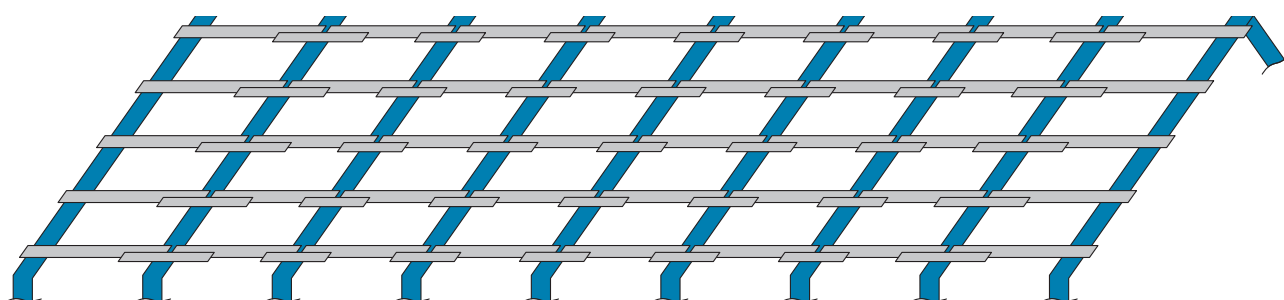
Arrangement of the HEB purlin system – single span lengths
